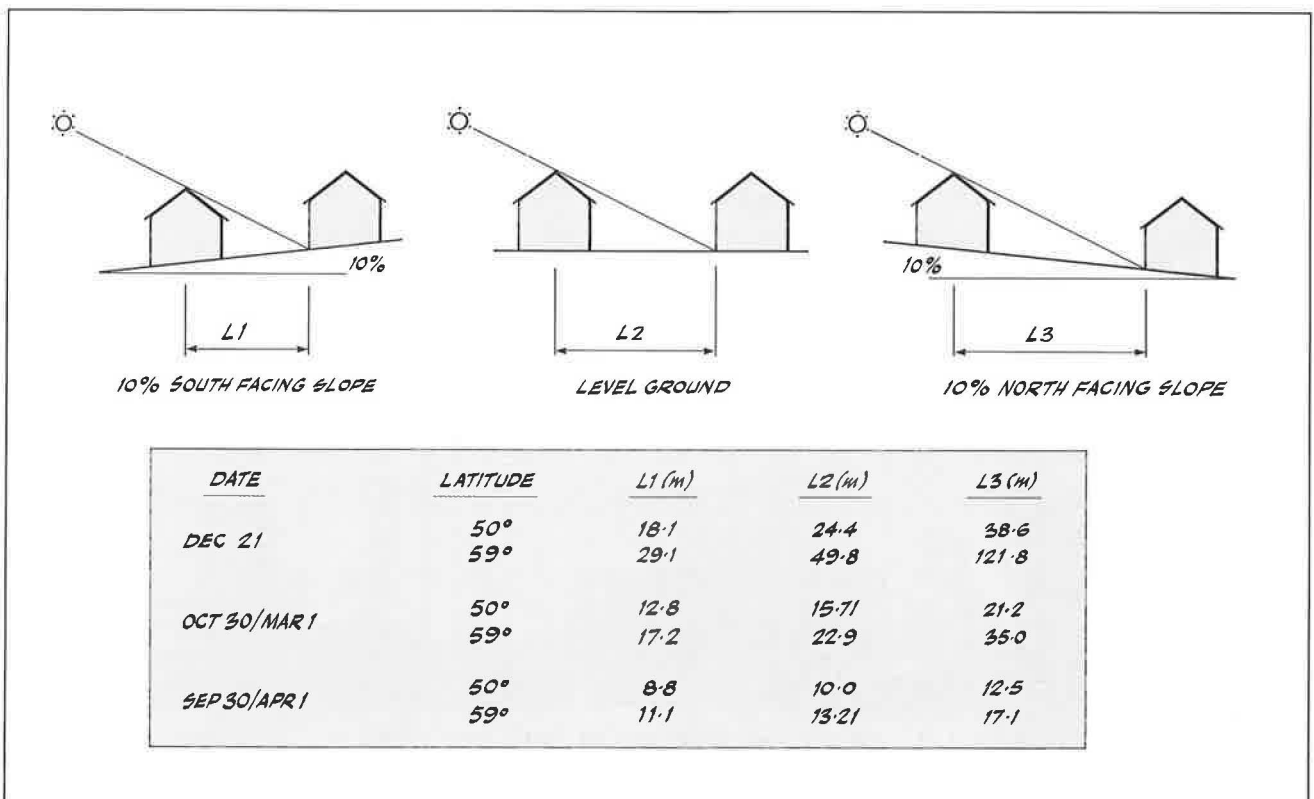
Minimum north/south spacings of a 7 m high east/west oriented building to achieve solar access at noon on various dates
